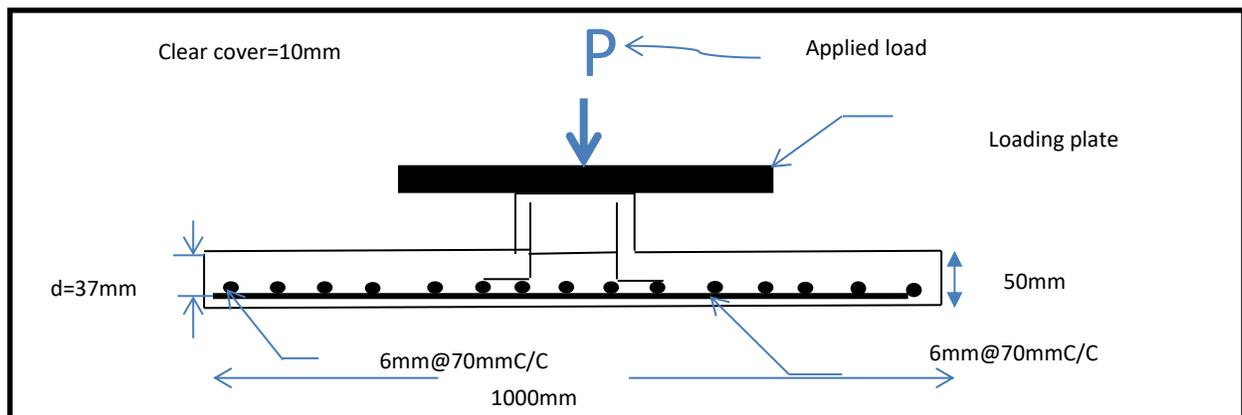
Details of specimens Cross-section and Load Arrangement to one column
